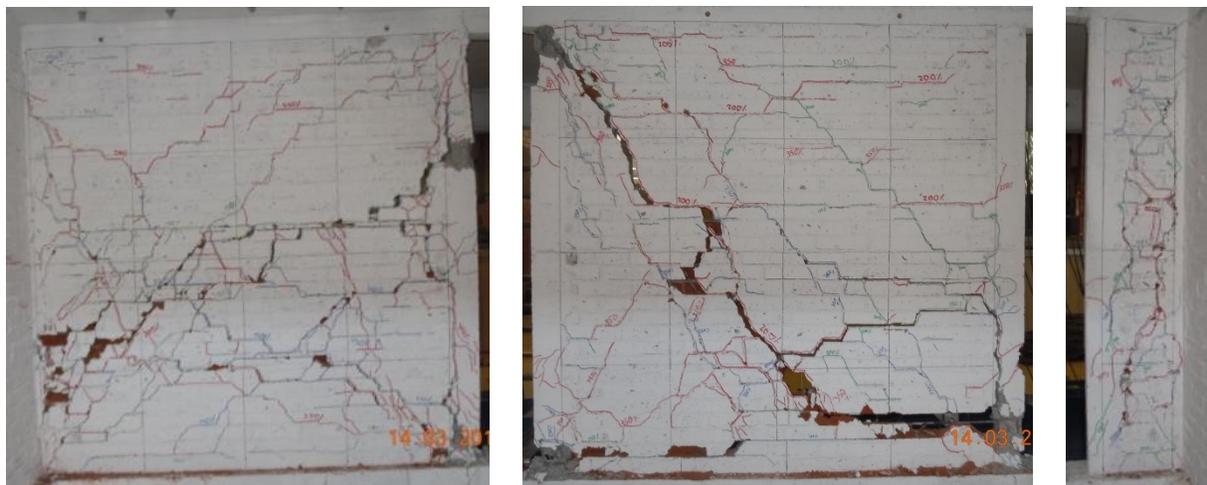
Final cracking pattern of Story 1, specimen M3ND-1, test stage 350%
